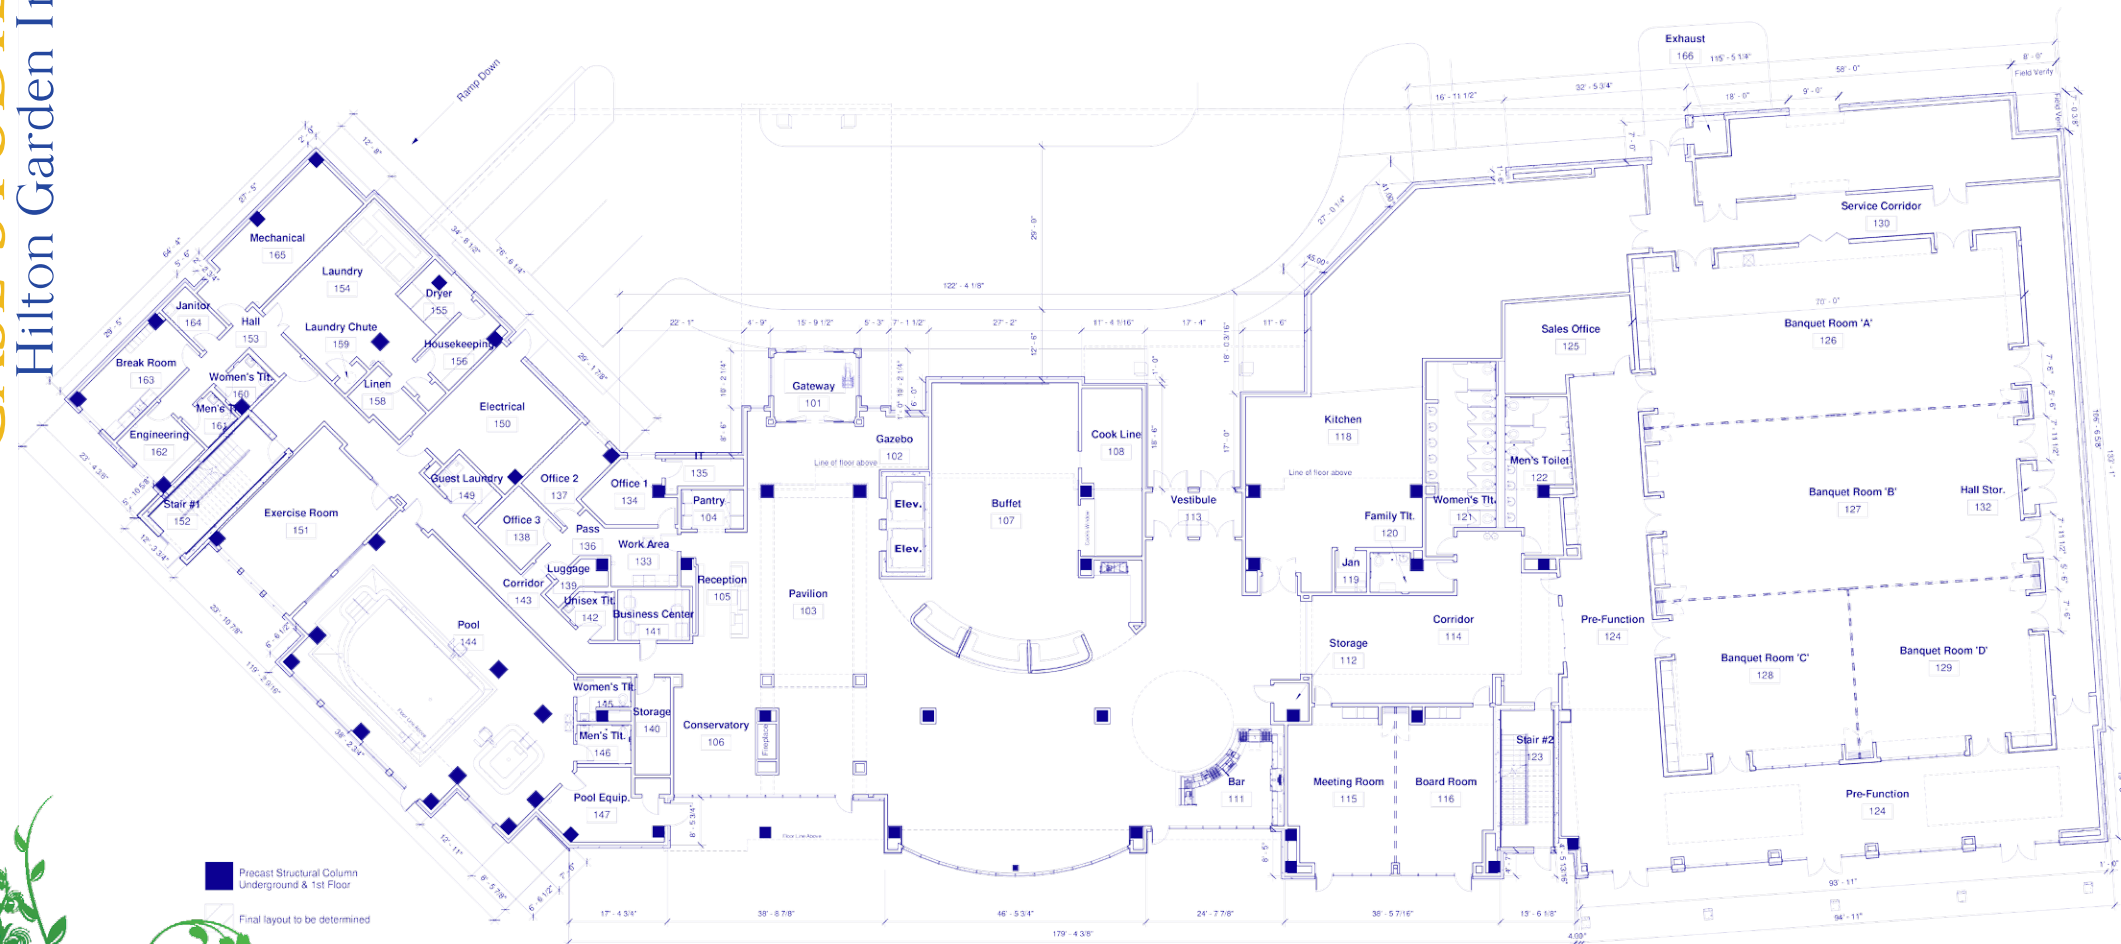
Hilton Garden Inn First Floor Plan (VanDeWalle, 2012)
